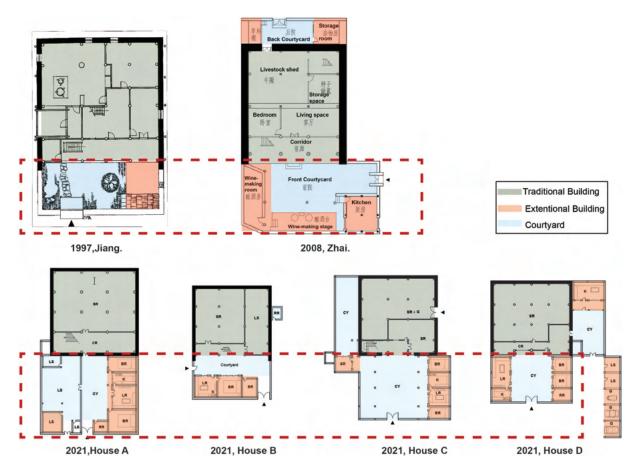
Floor plans of Shangri-La's Tibetan dwellings during the past decades.
